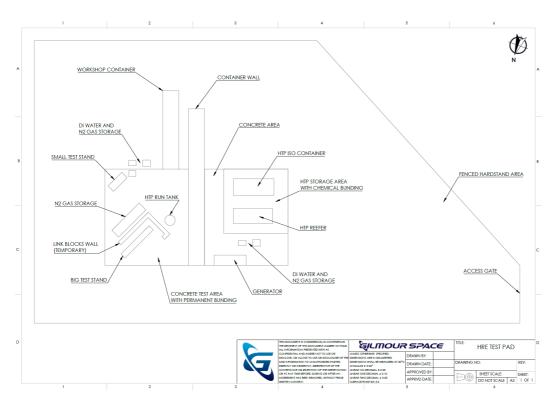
HRE Test Pad Typical Layout (Source: HDGMP prepared by Gilmour Space, refer to Appendix 10)
